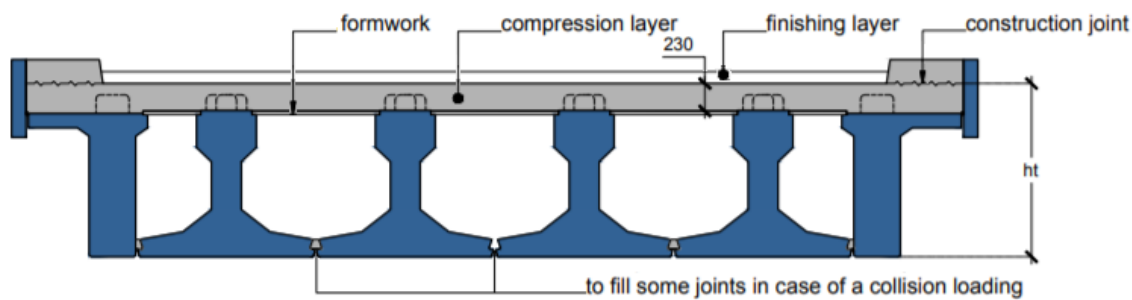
Cross-section of a girder (ZIPXL; inverted T-profile) deck [75] (adapted)
